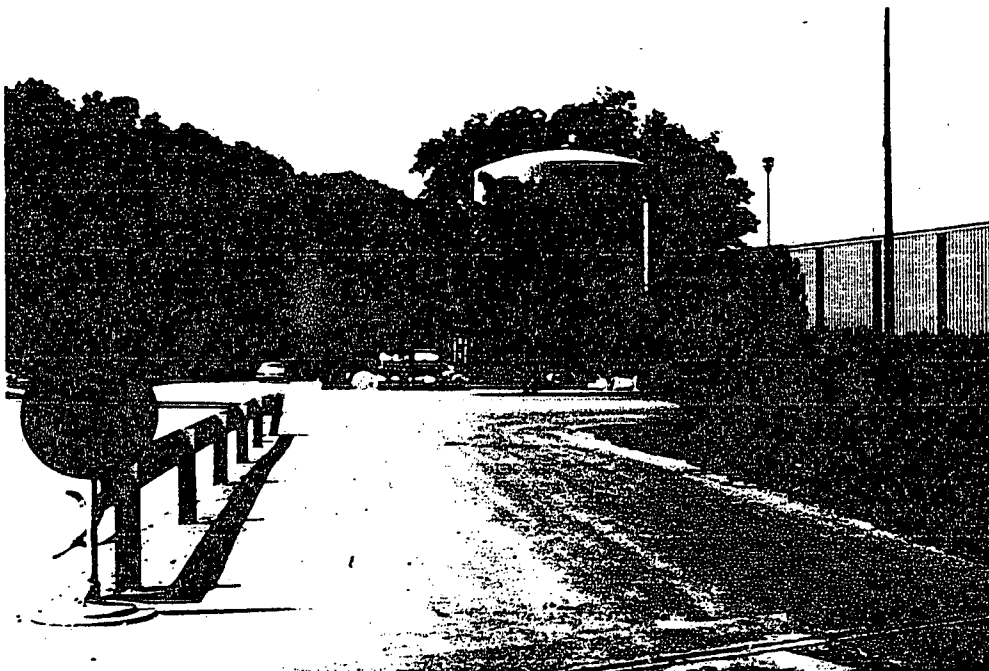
New aboveground fuel oil spill prevention building on old duck pond location (looking towards railroad berm).
